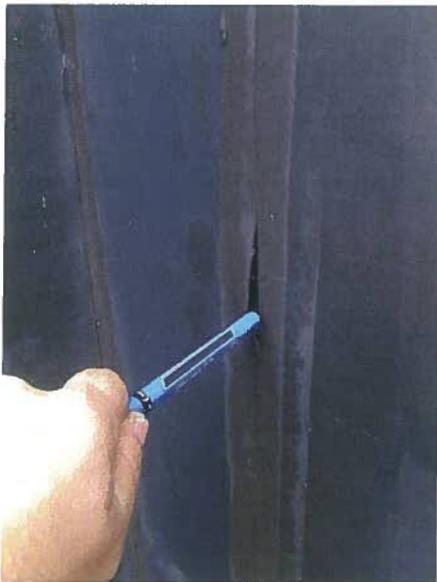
Failing EPDM flashings and EPDM lap sealant.
